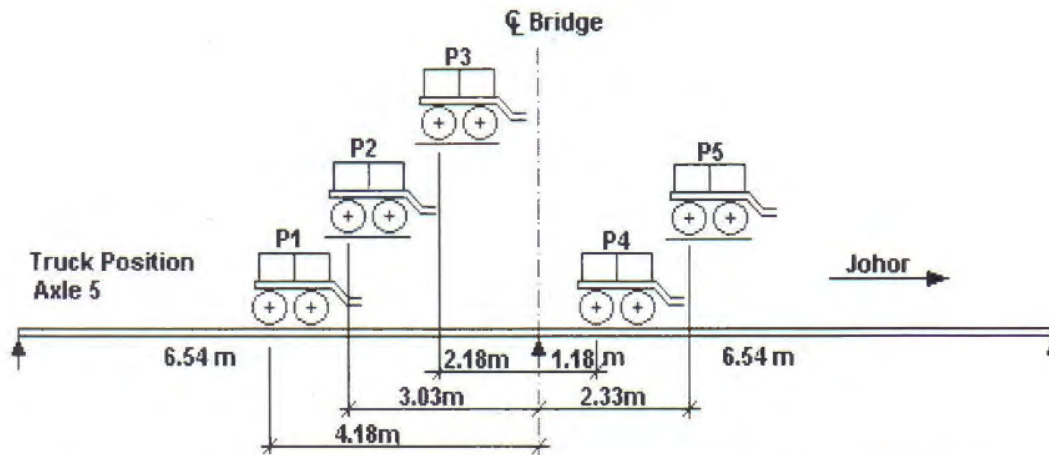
Example of longitudinal position of test truck: Bridge FT001+149.2
